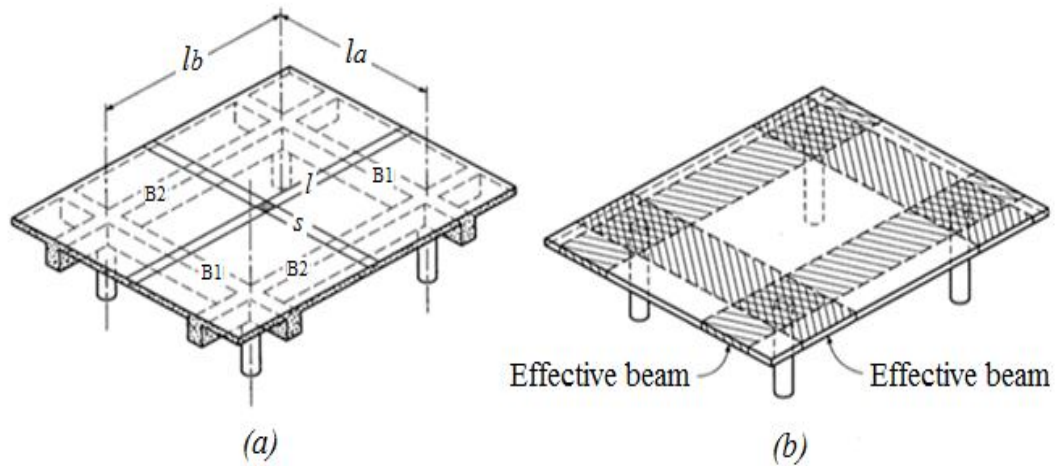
column supported two-way slabs (a) two-way slab with beam
